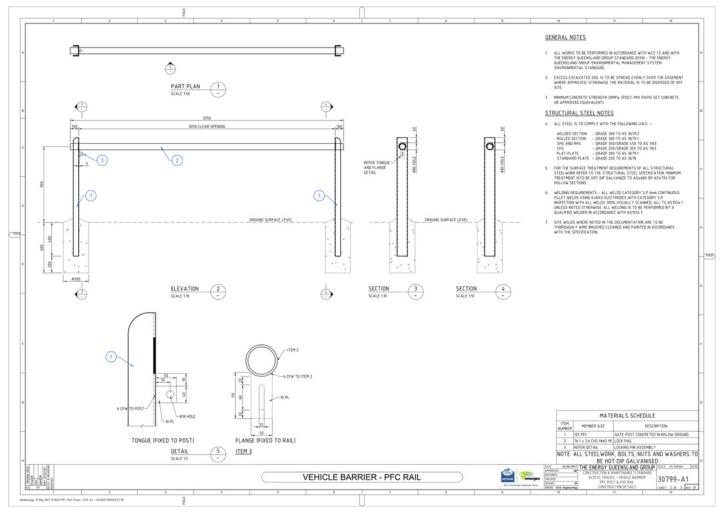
Access Track Infrastructure – Fencing Locking Rail – PFC Post and CHS Rail Barrier Details.
